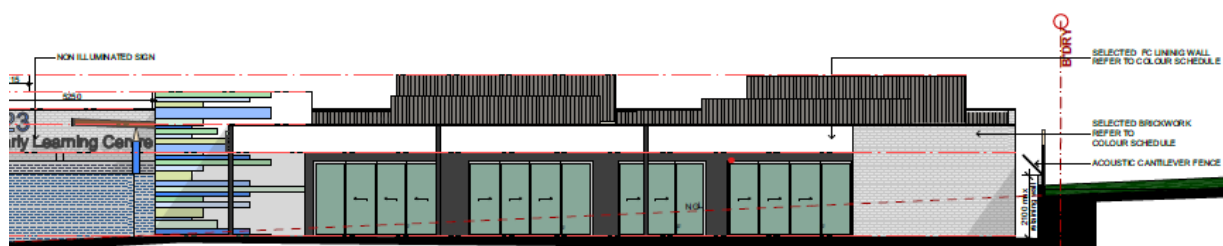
Extract of the western elevation of the proposed development which highlights the extent of proposed cut to the rear of the site. A 2.1m retaining wall is proposed to the rear boundary of the site. With an acoustic cantilever barrier wall and boundary fence proposed.
